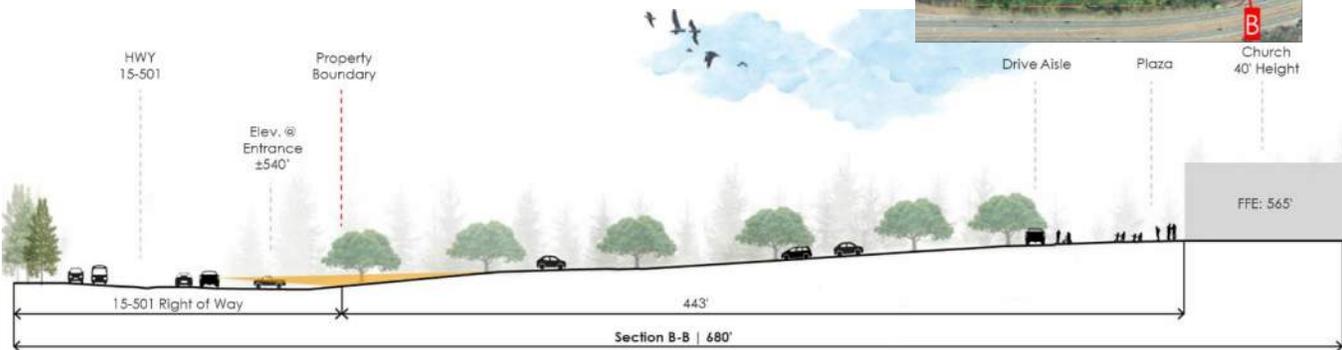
Proposed Section US 15-501 east along the main entrance drive to Proposed Church Building
